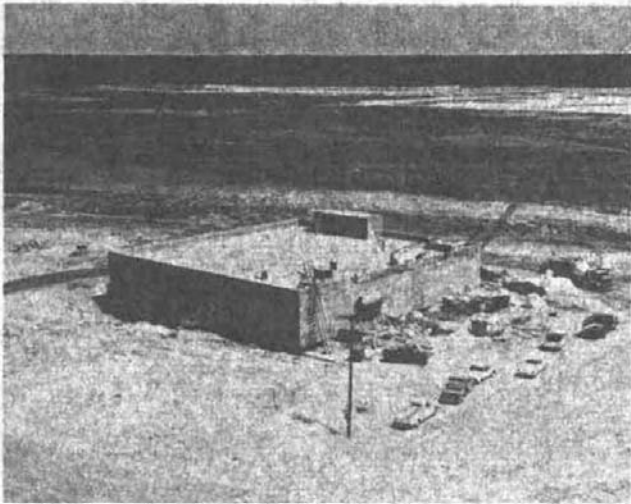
MTF S-IC TEST CONTROL CENTER SHOWING CONSTRUCTION IN JUNE 1965
